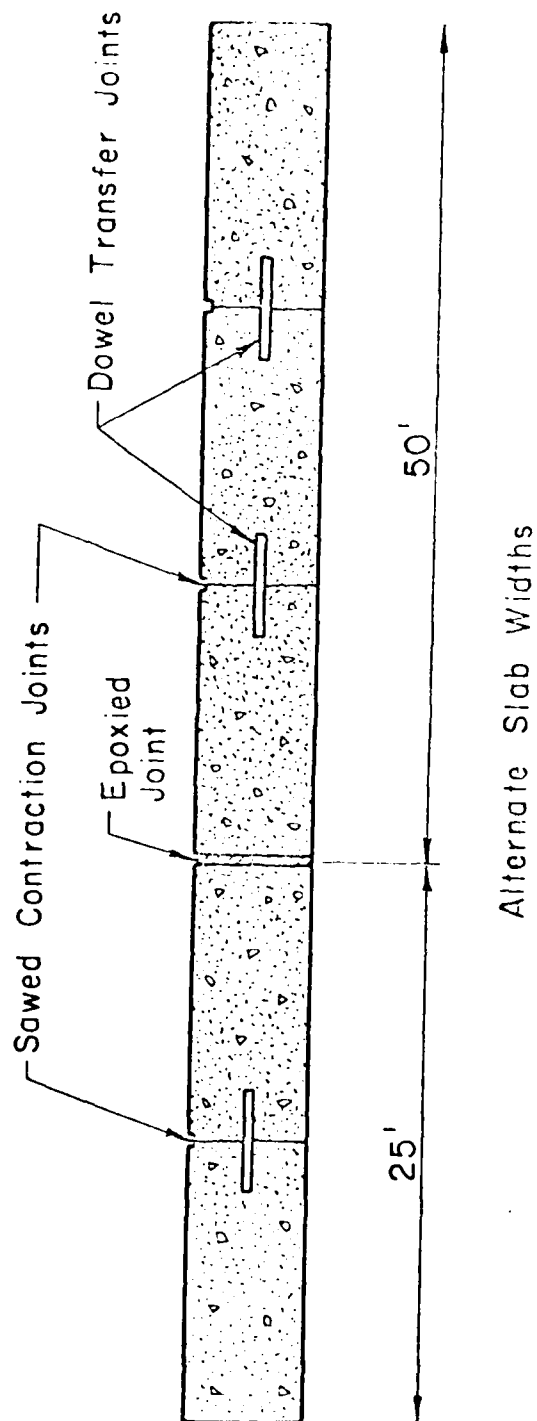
Alternate Construction Procedure for Installing Dowels at Longitudinal Joints with Slip-Form Paving Operations
